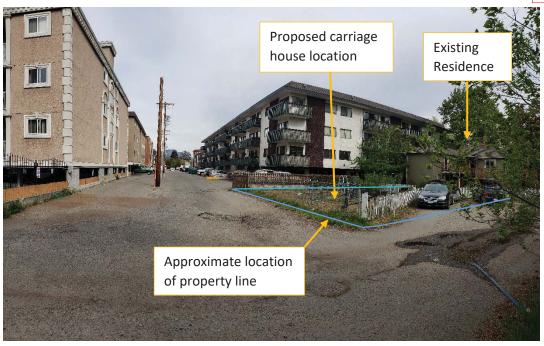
View of proposed carriage house location with four-story apartments located immediately to the north and east. Photo taken facing east.
